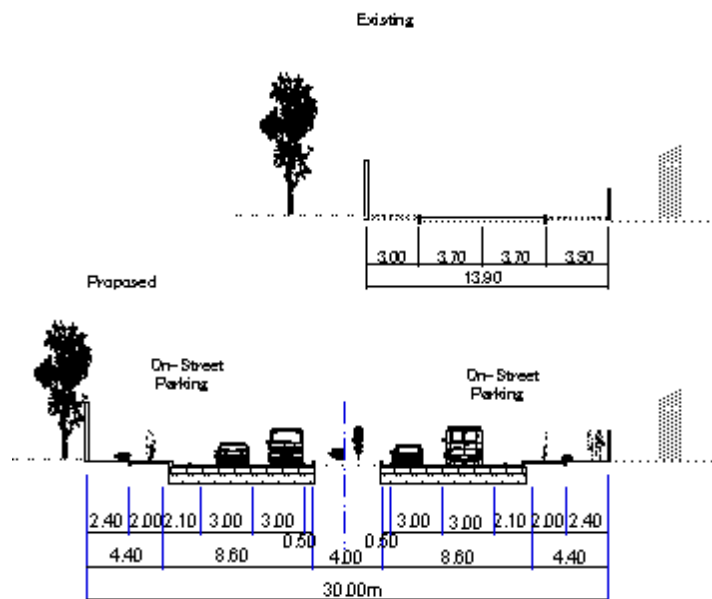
Proposed Cross Section for Rua da Marinha
